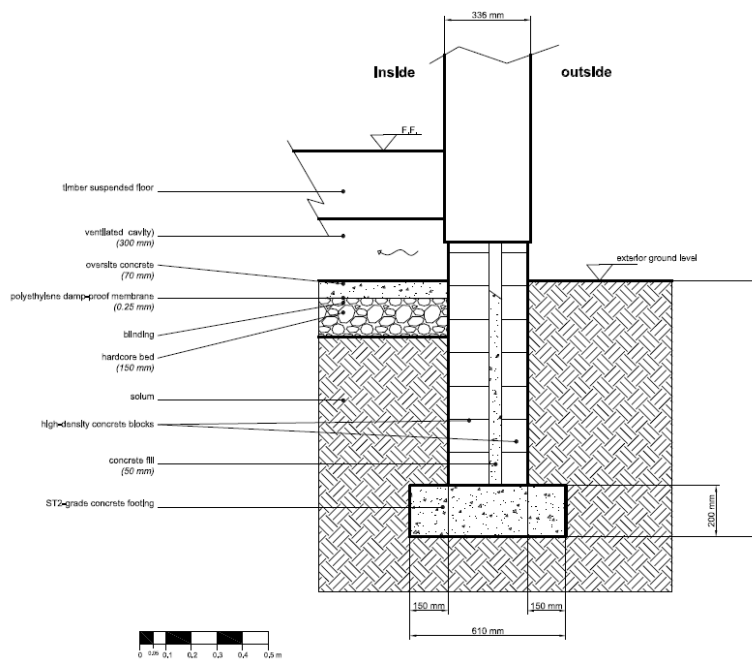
Foundation A (heavy-weight external cladding), vertical section.
